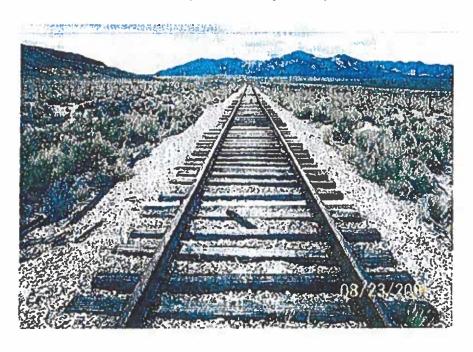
Mile Post 63, Looking South, 90# Rail Approaching Curves to South
